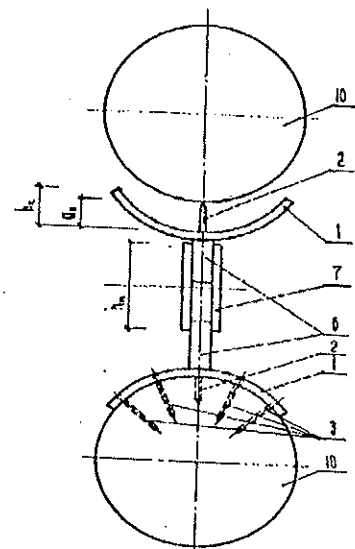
Side view prior to assembly of top and after assembly of bottom part of log-beam element, with logs supported by curved bearing plates.
